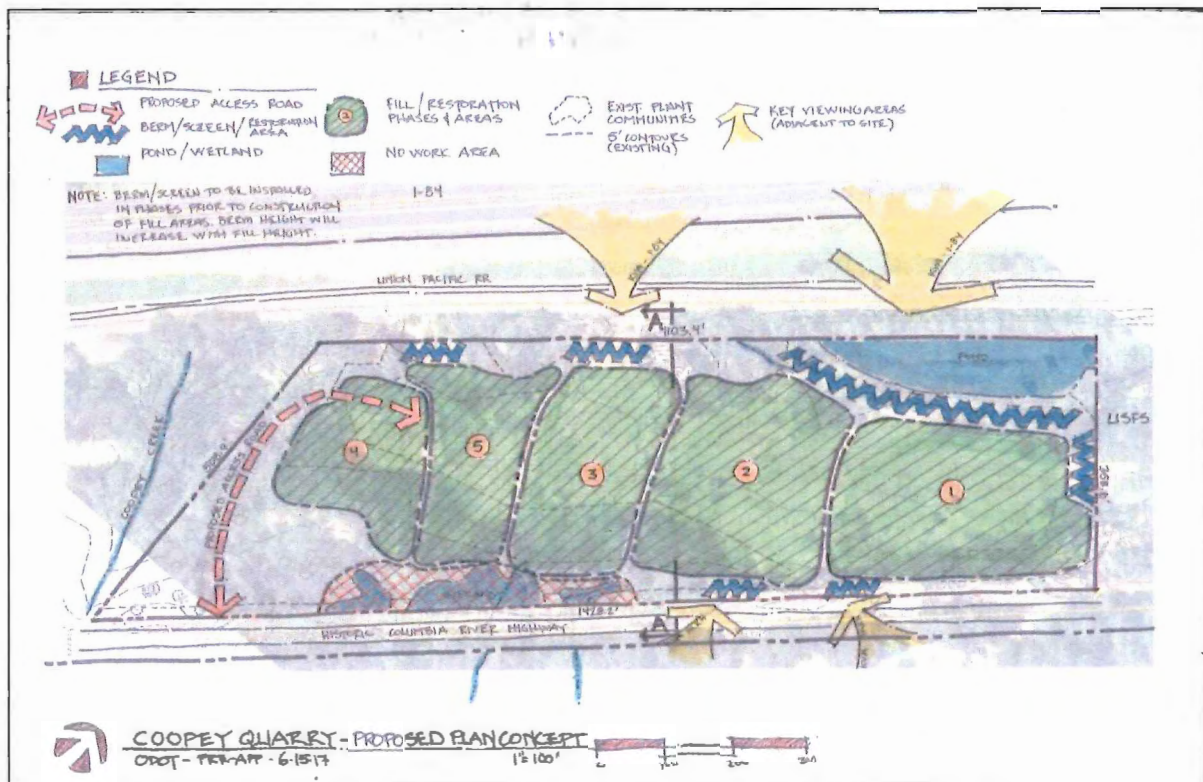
Preliminary disposal fill plan and sequencing showing work zones and berm locations.
